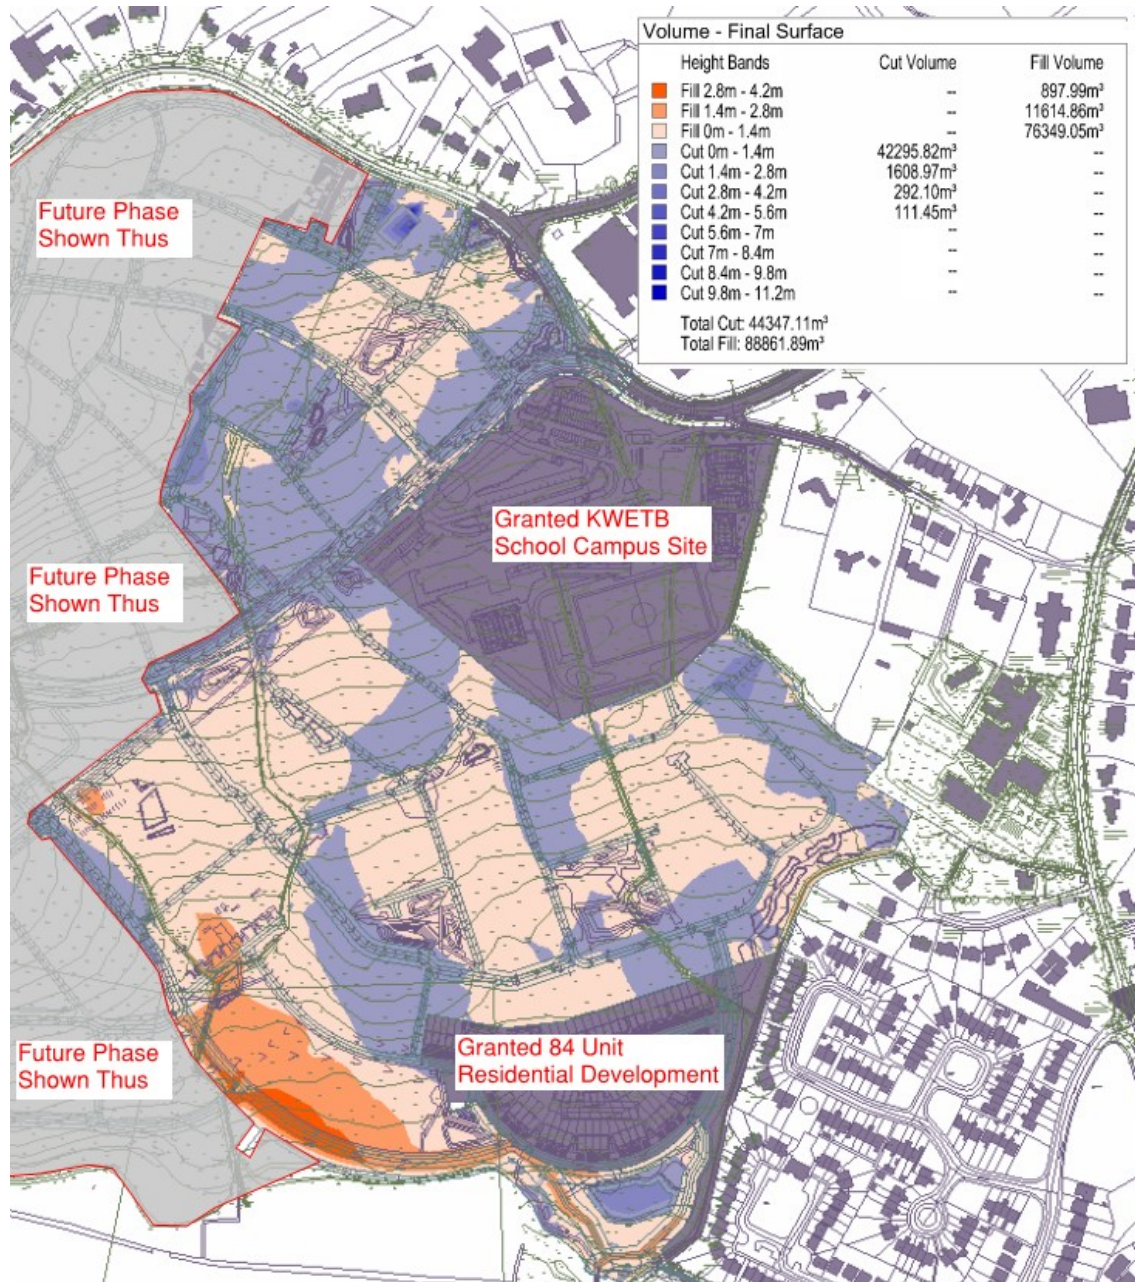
Site Isopath illustrating site areas subject to Cut & Fill
